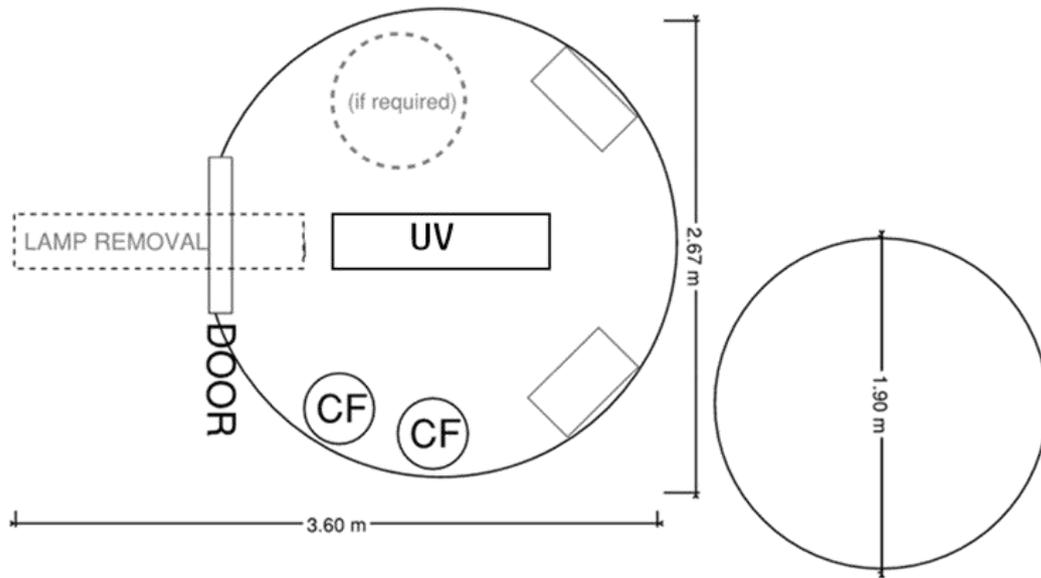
Option 1 Layout shown in a concrete Hynds Killing Shed
